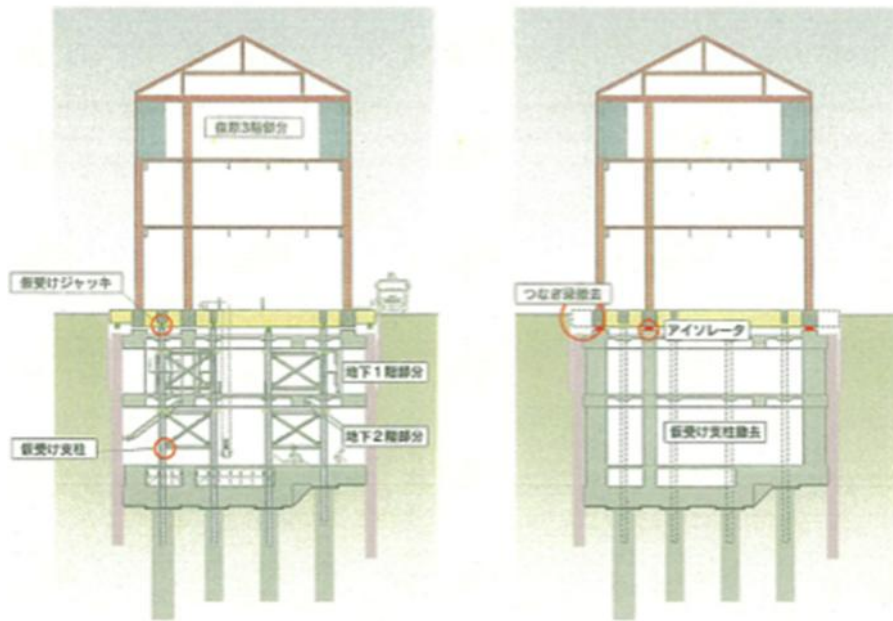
Underground excavation – Construction Method.²⁴⁰
